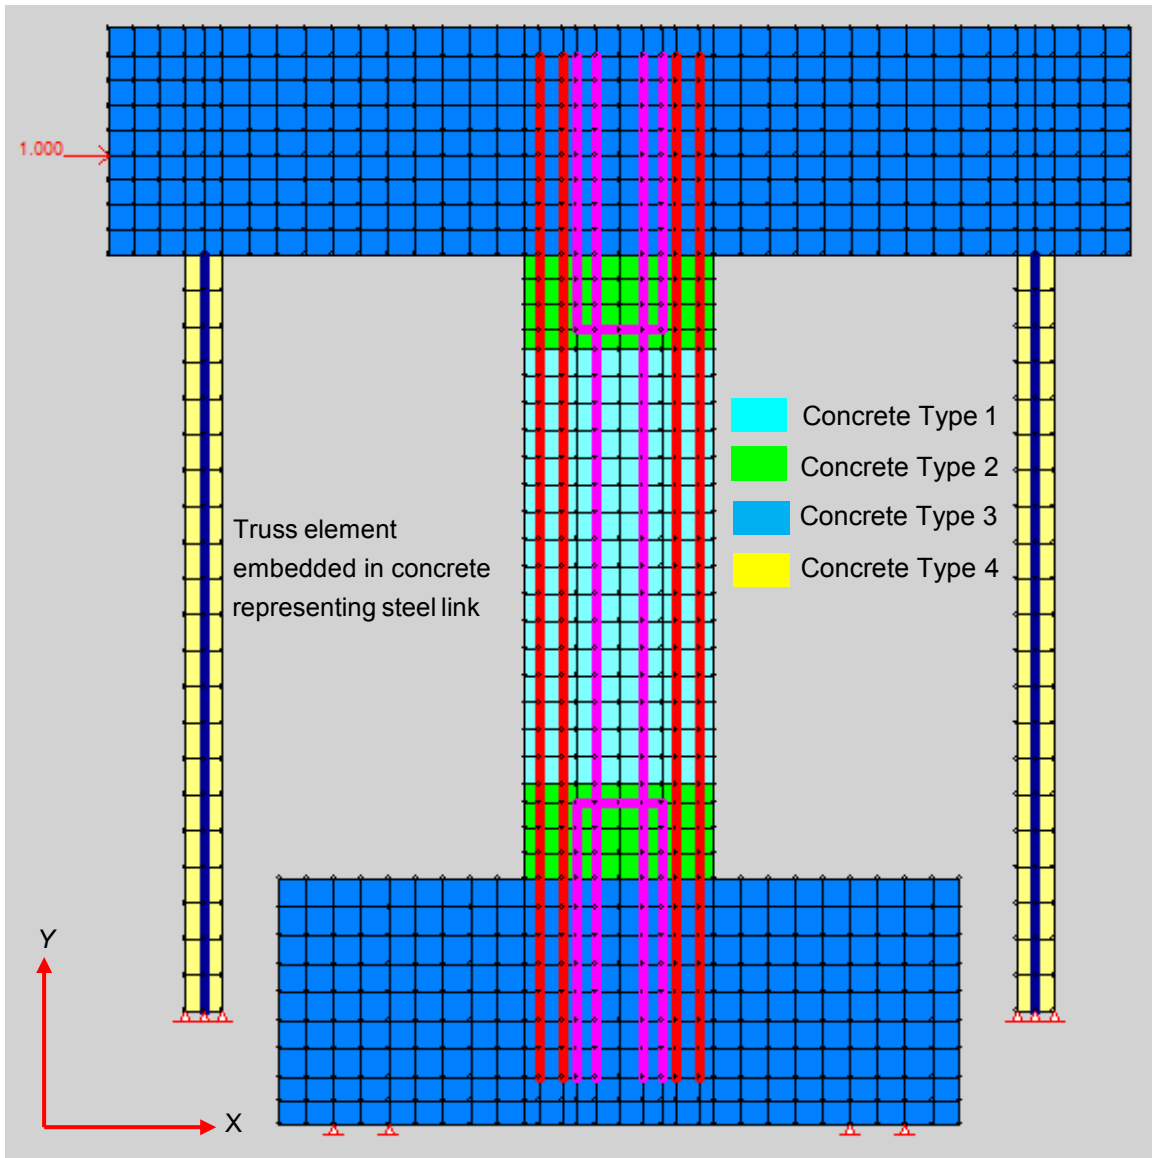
Concrete Type 4 and truss elements used to model steel links
